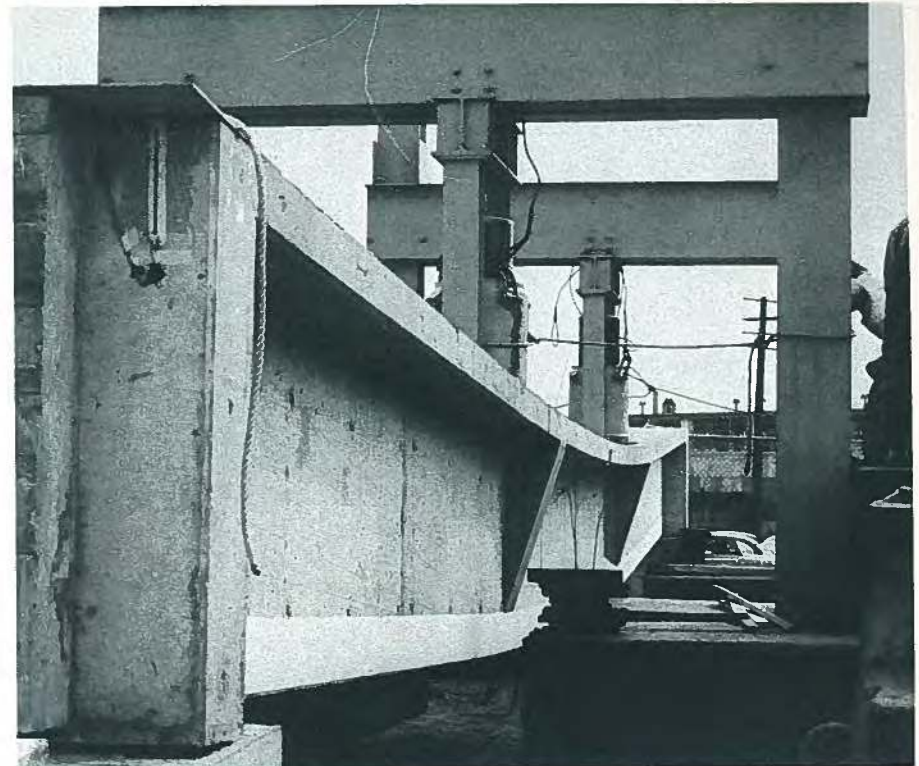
Loading of 60-ft (18.3 m) prestressed girder (F-60) using bonded tendons. At four times the design load the girder deflected 12 in. (305 mm), displaying enormous ductility and prompting a reporter to headline "Rubber Concrete Carries Severe Overload."
